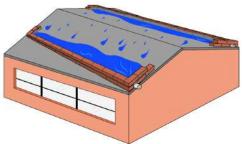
Bird's-eye (top) view of a concrete gable roof with brick rain catchment. Notice how the bricks slope up the roof to one side, causing the water to run to the pipe in the corner. You can catch rain off one side of a gable, or both.
